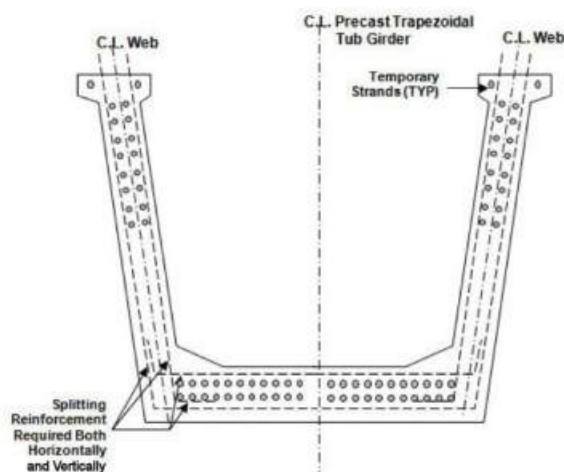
Precast Trapezoidal Tub Girder
